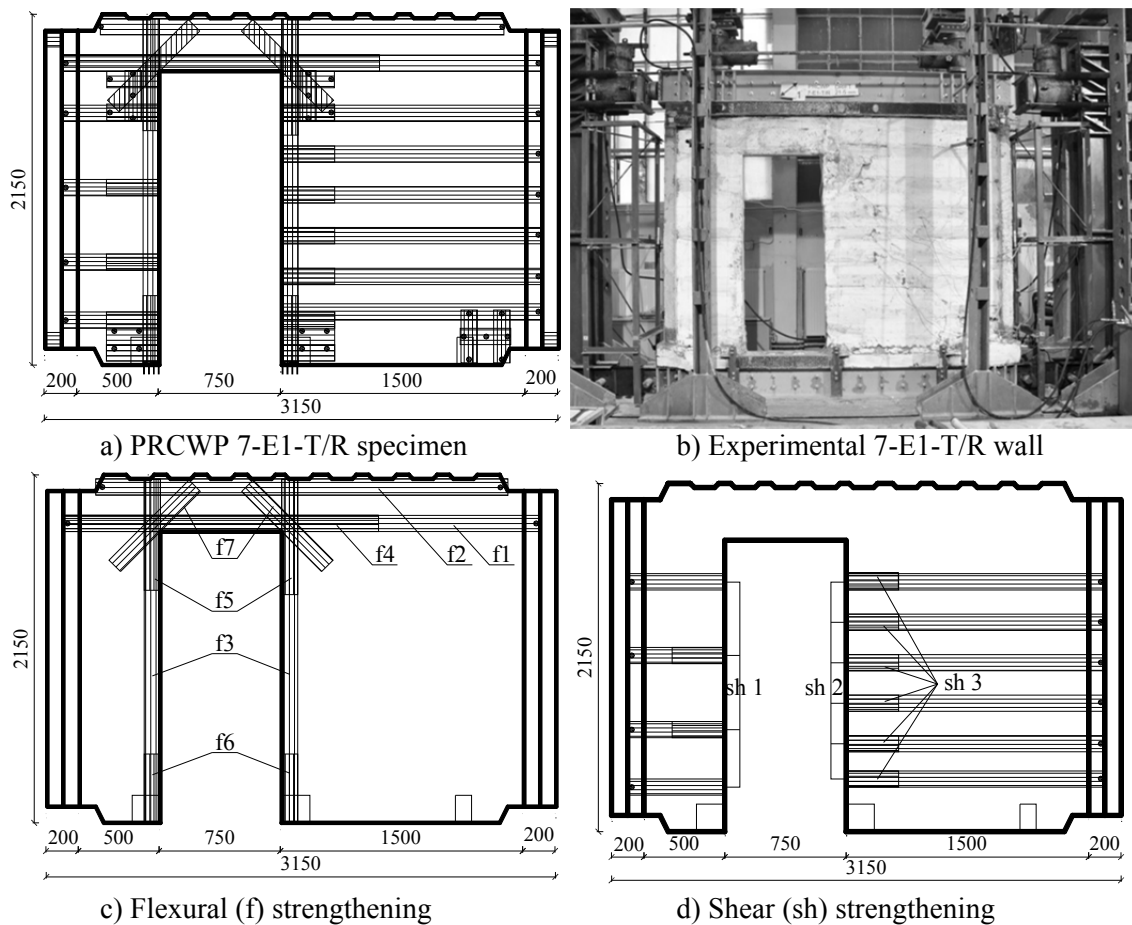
The precast reinforced concrete wall panels comprised in the experimental program.
